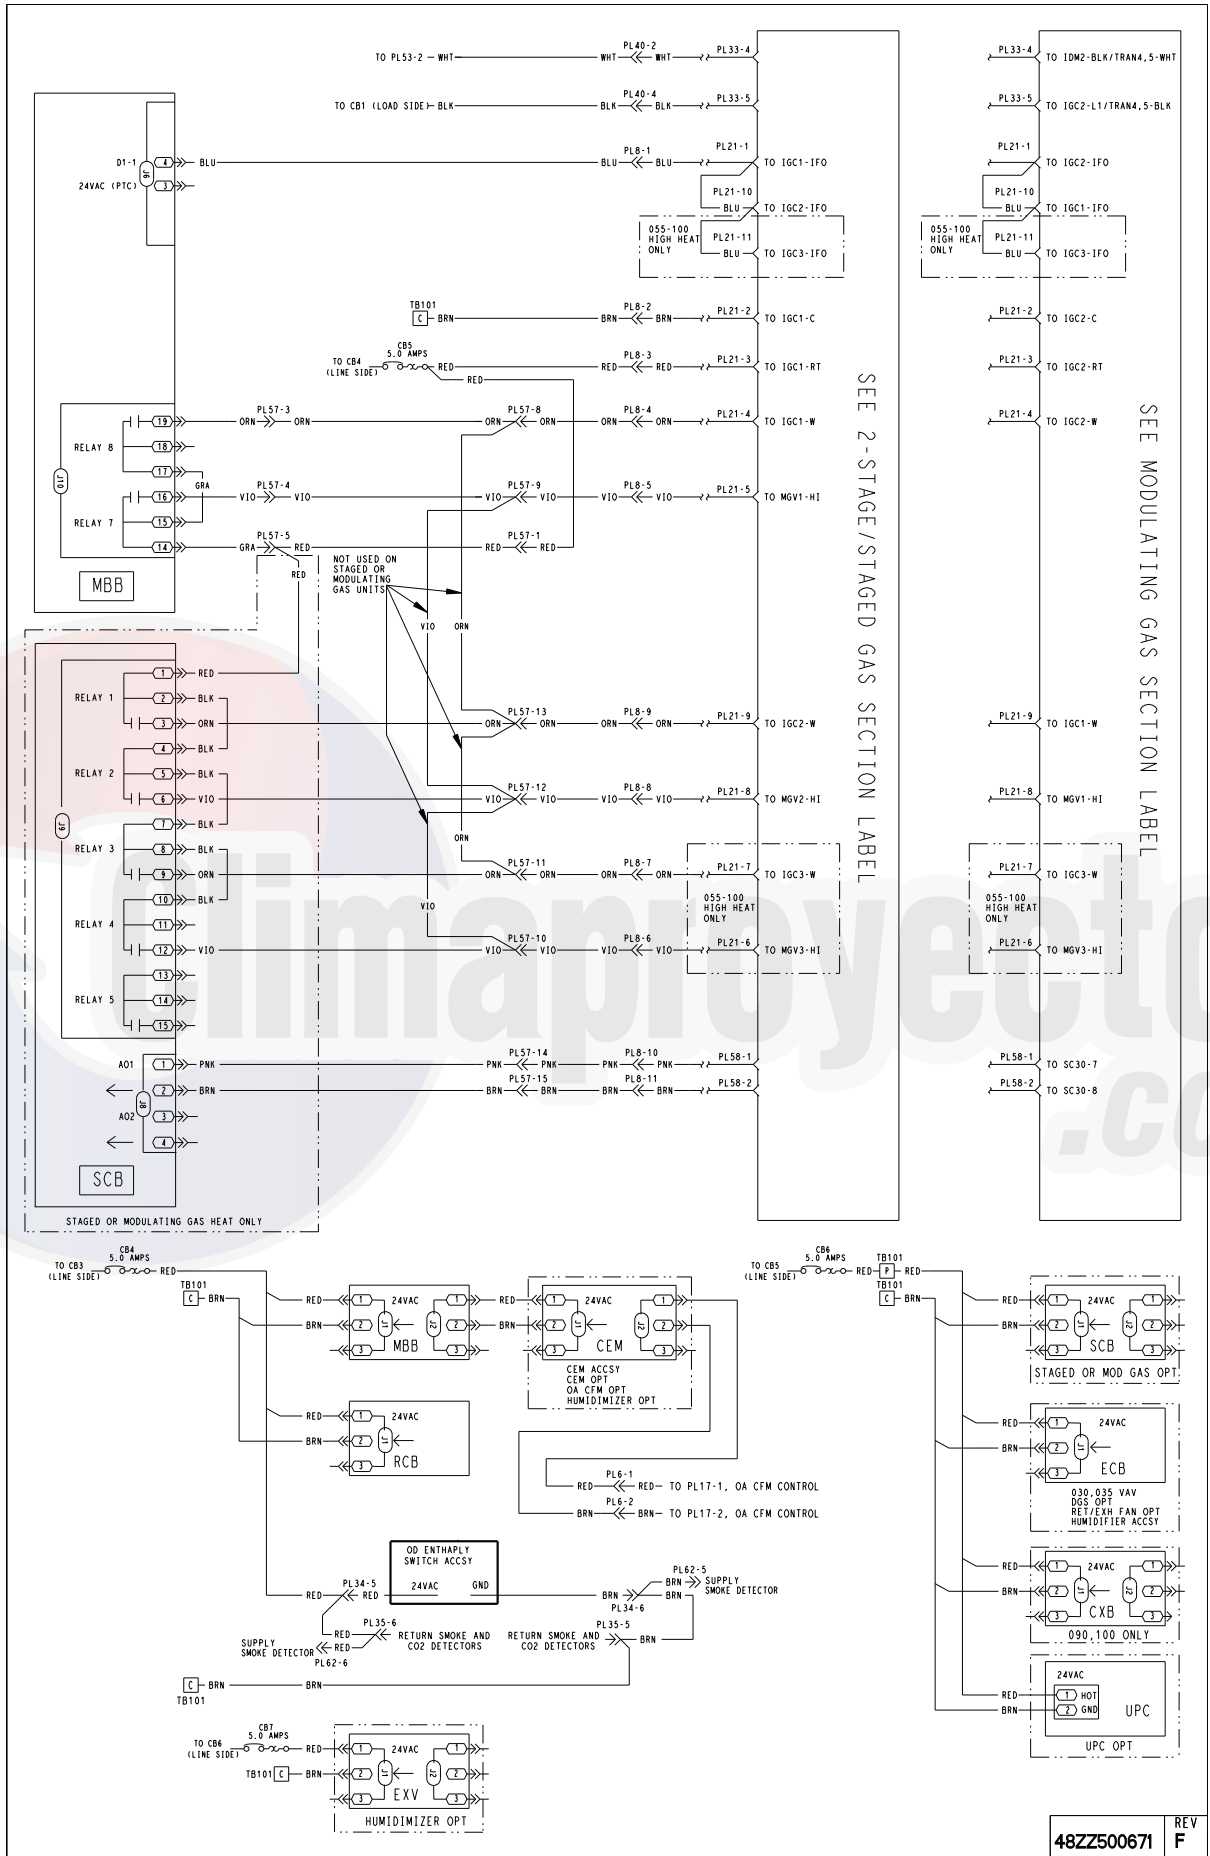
Typical Gas Heat Unit Control Wiring (48P030-100 Units Shown)
